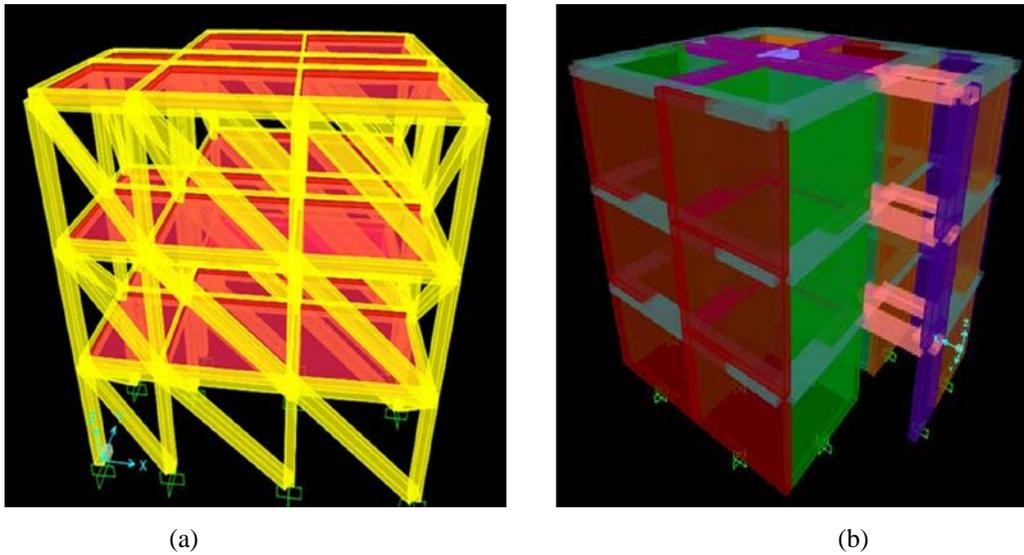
SAP model of the study building: (a) RC frame with masonry infill by equivalent strut (b) confined masonry wide column model
